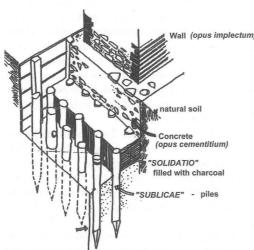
Basic system of foundations on piles (Cairoli 1995, 128)
